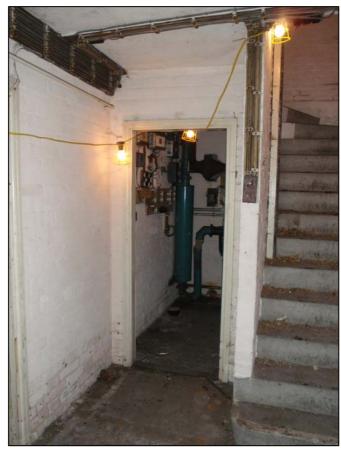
Room B1, view into B6, camera facing south-west (ref. HLY 44)
